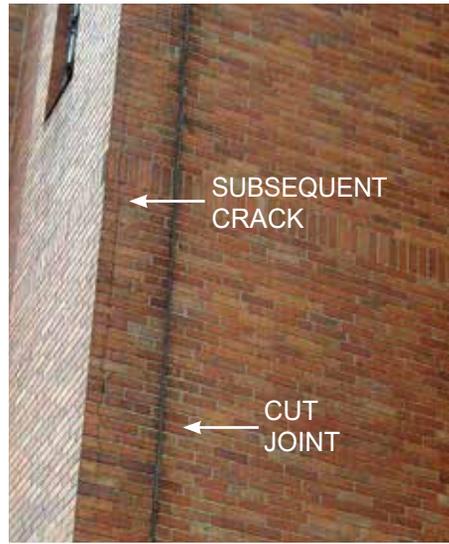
Ineffective repair. The vertical joint was cut without cleaning steel – a new crack appeared.
